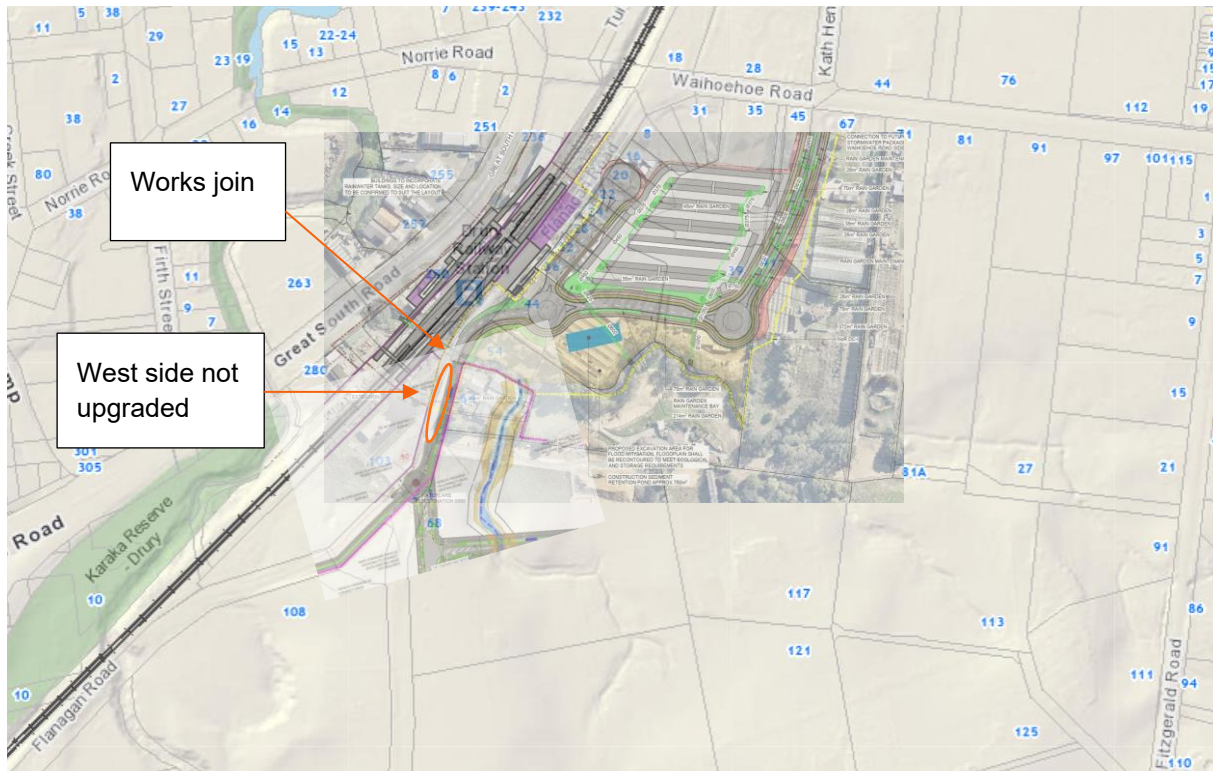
Flanagan Road upgrade (Kiwirail station – fast track application)
